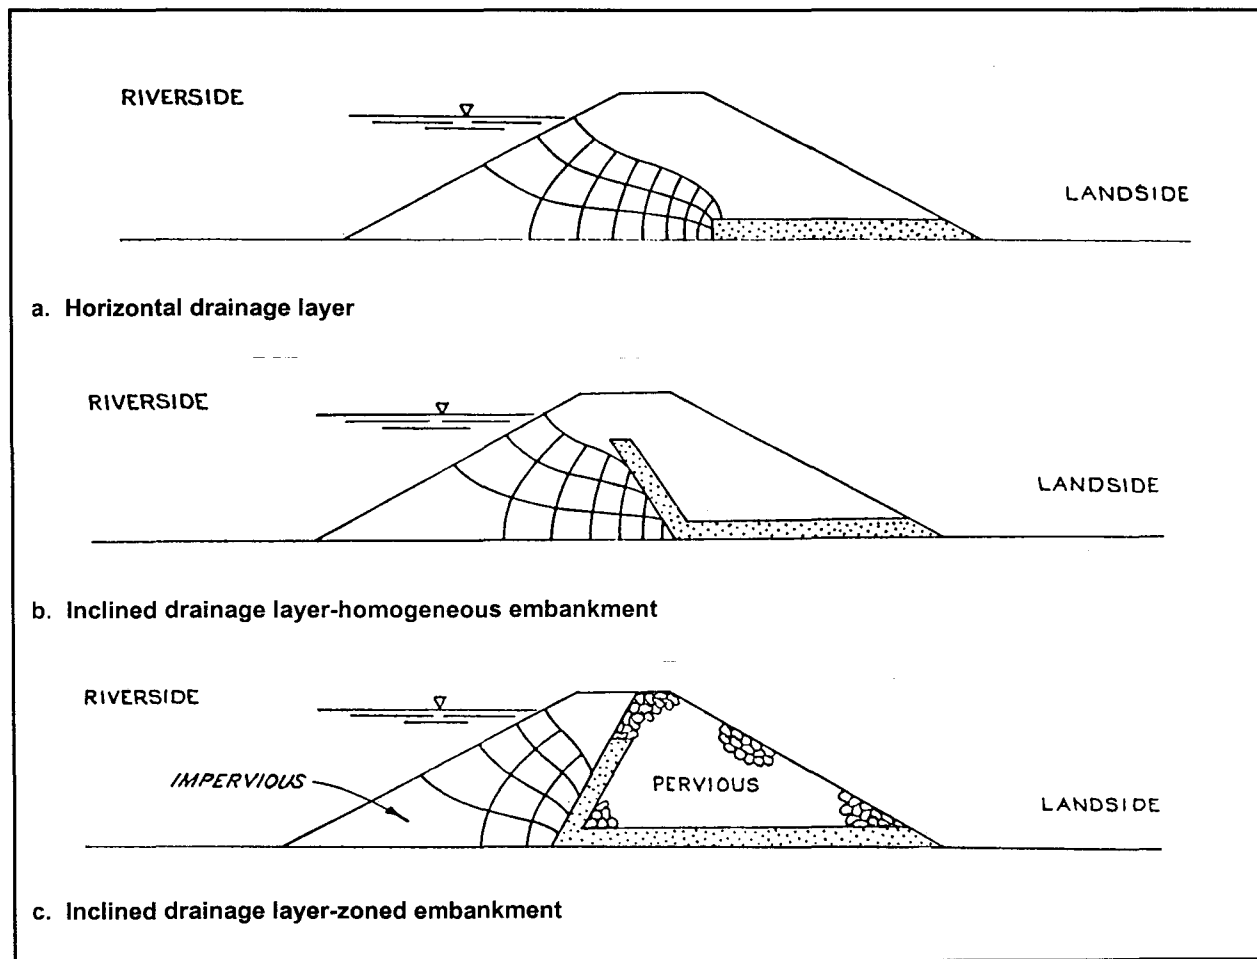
Use of horizontal and inclined drainage layers to control seepage through an embankment
